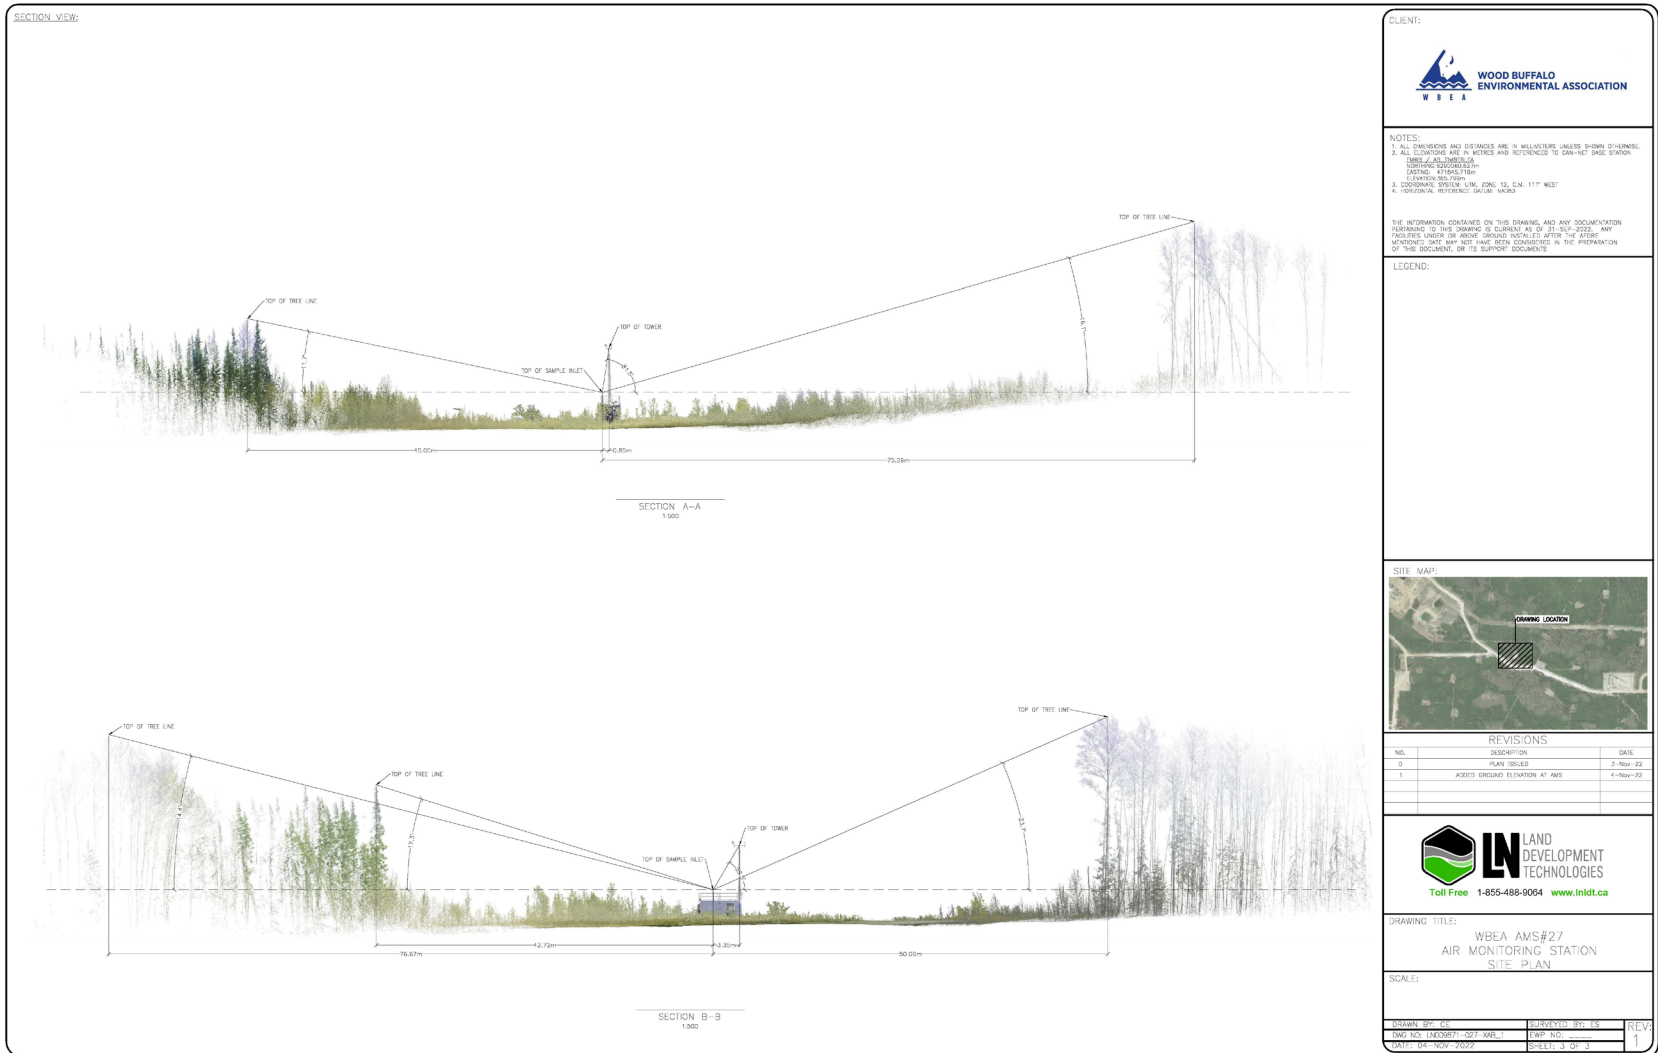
Cross-Sectional Elevation Drawing of AMS 27.
